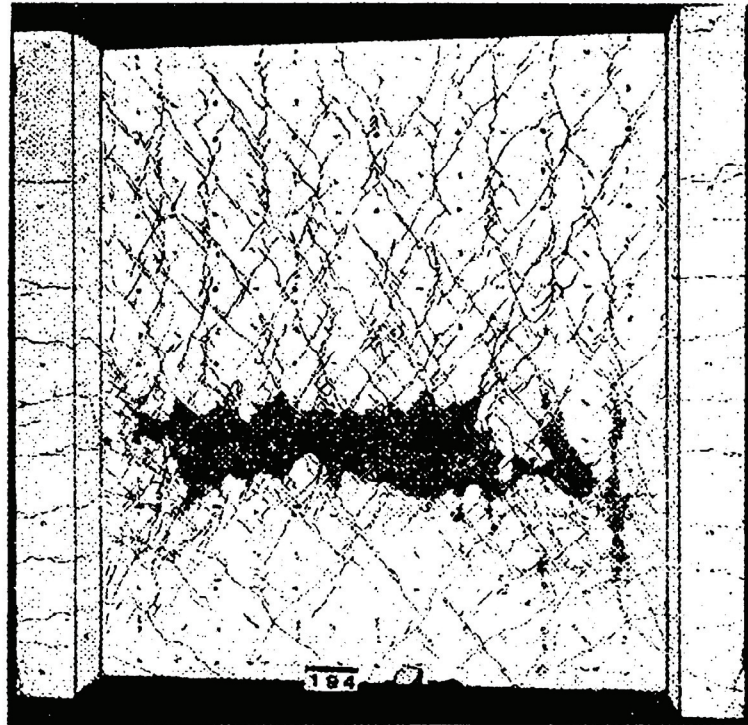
Cracking pattern for wall S7 tested by Maier and Thürlimann (1985) at crushing of diagonal compression struts
